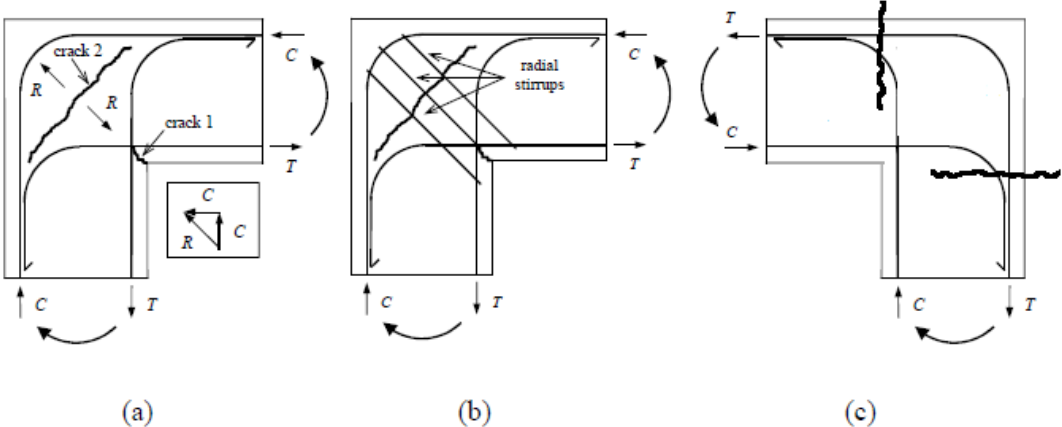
Failure modes corner subjected to an opening moment without (a) and with radial stirrups (b) and corner subjected to a closing moment (c) (Johansson, 2000).
